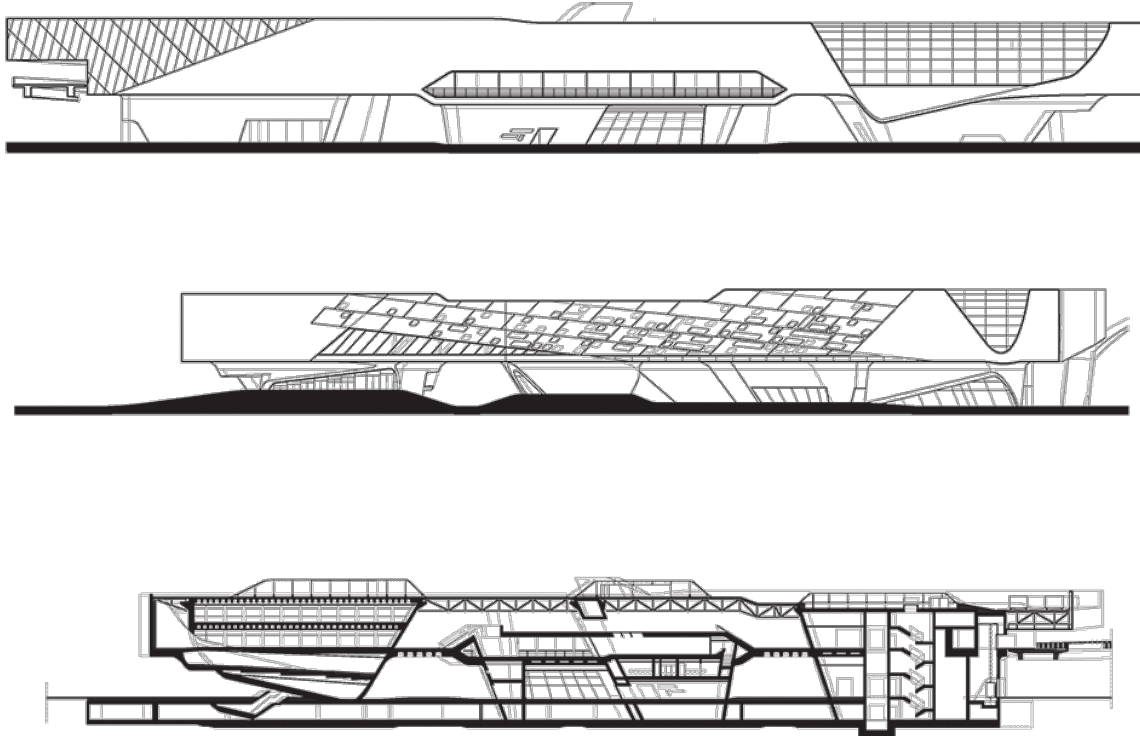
North Elevation <top>, South Elevation <middle> and Main Section <bottom> (Zaha Hadid Architects, 2005)
